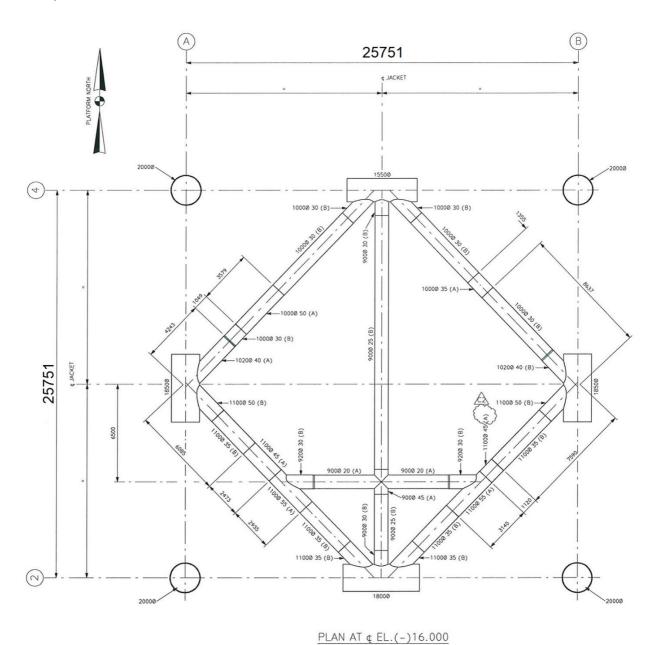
Solan jacket bracing plan at EL. -16.000
